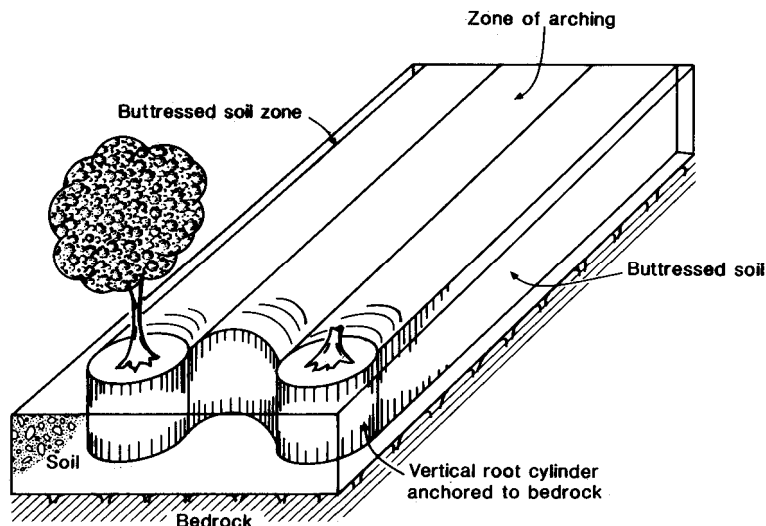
Root buttressing, anchoring and arching (Source: Greenway 1987)
